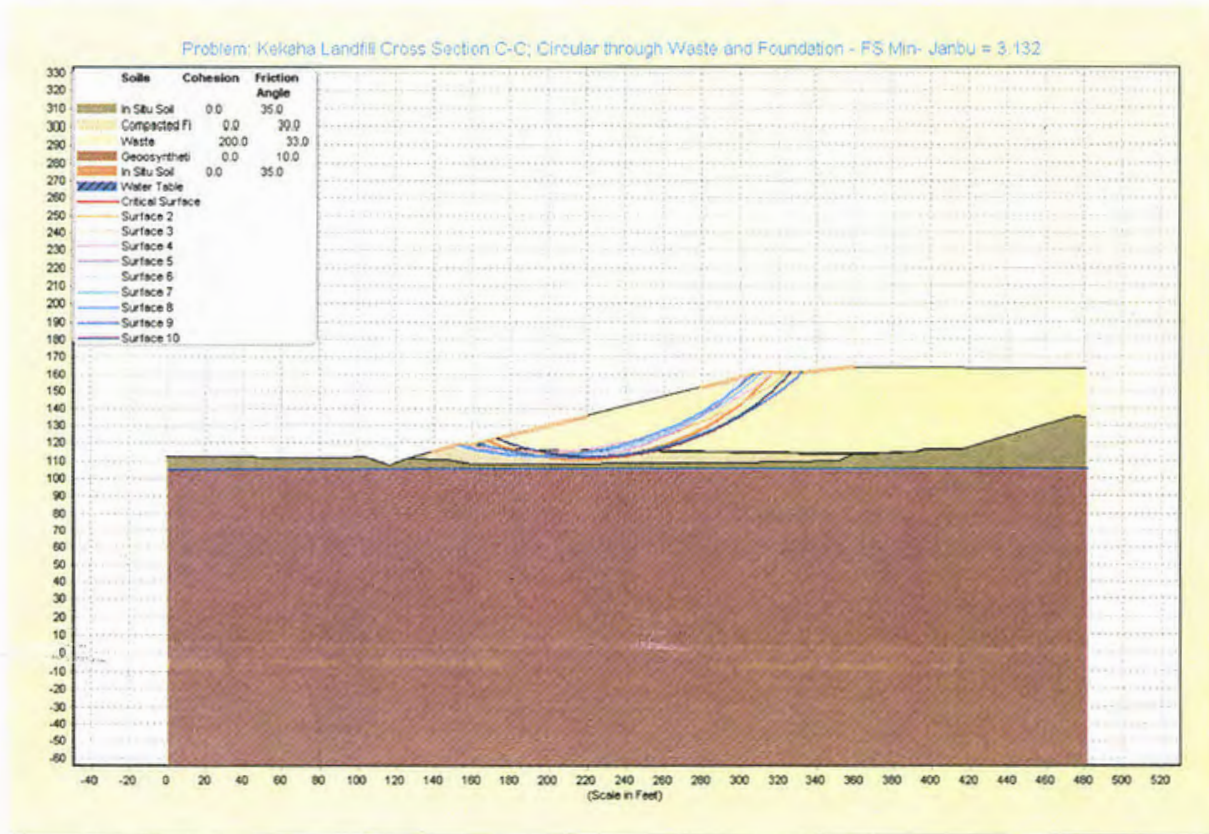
Section CC, Circular Failure, Waste Mass and Foundation Soils, Through Cell 1
